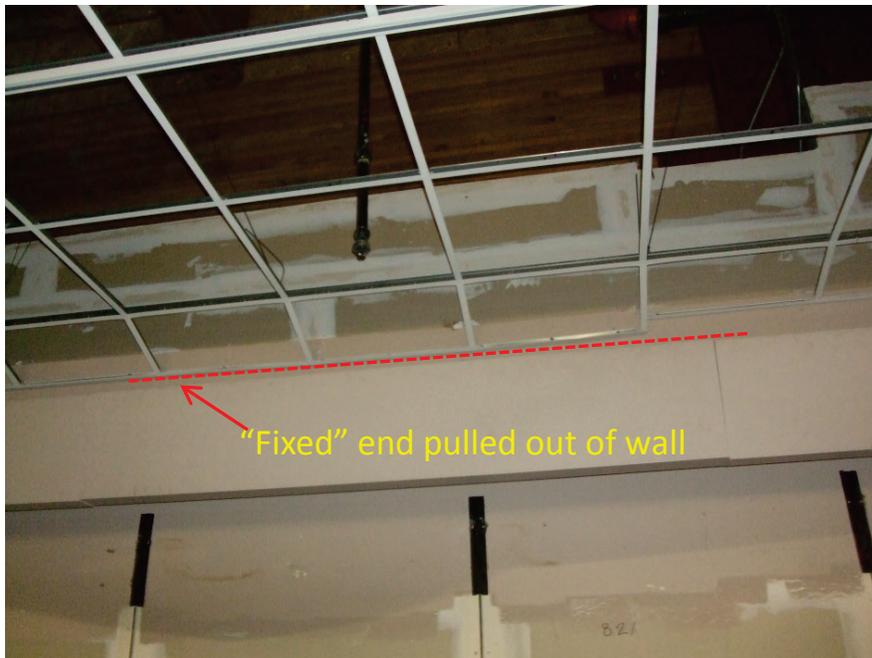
Failure of “fixed” end support of the acoustical tile ceiling grid in a two-story retail store in downtown Napa.
